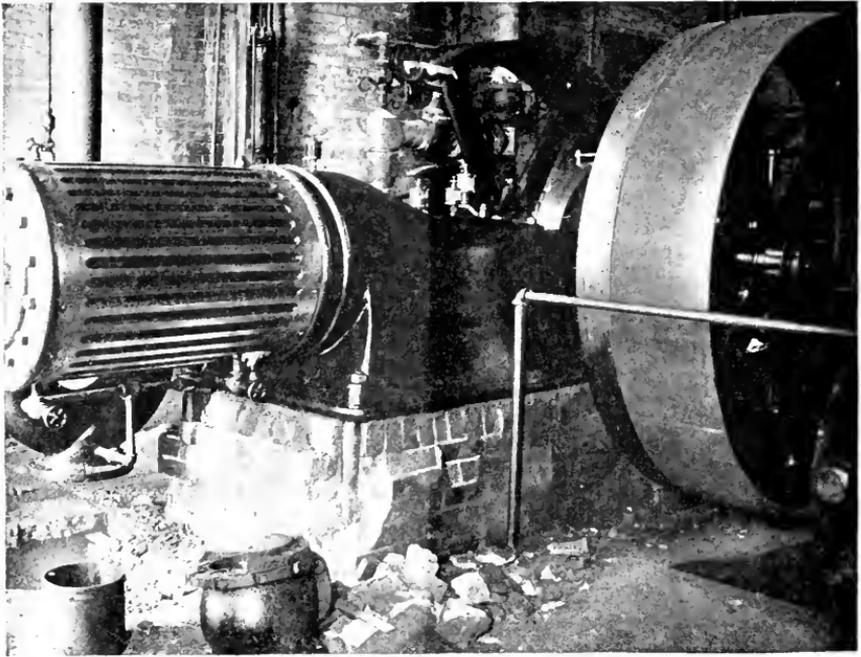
SHOWING THE DAMAGED FOUNDATION.
